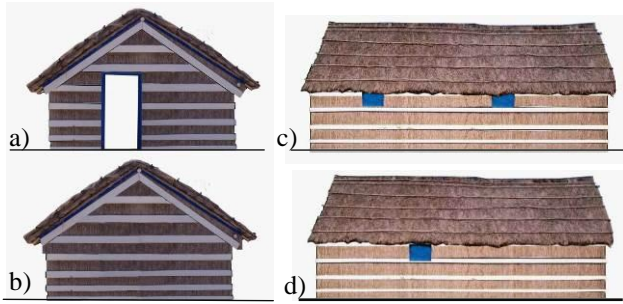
Carrasqueira hut: a) Entrance façade; b) Back façade; c) and d) Side façades.
